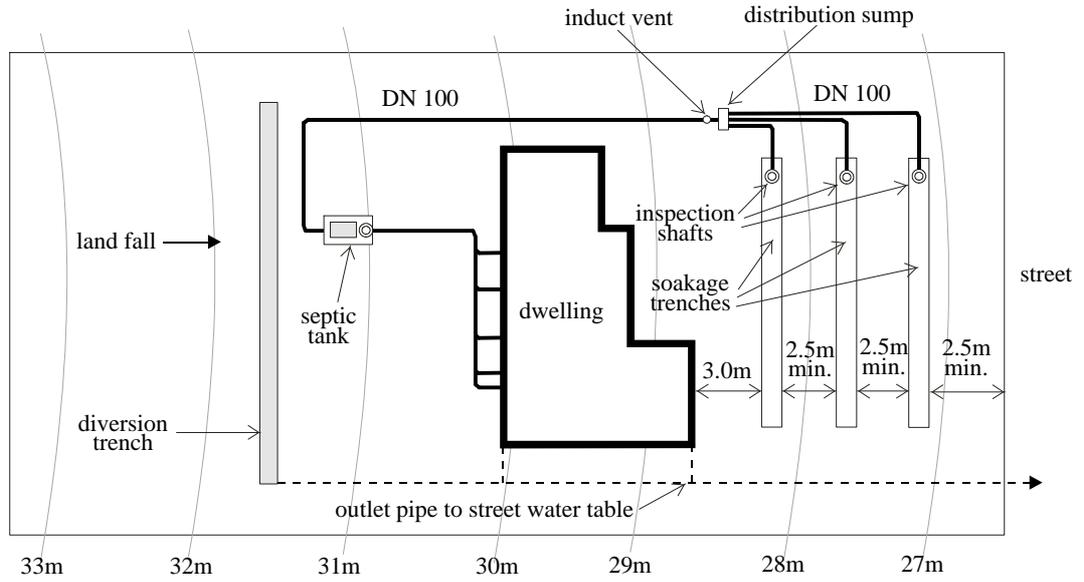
DIVERSION & SOAKAGE TRENCH SECTION
